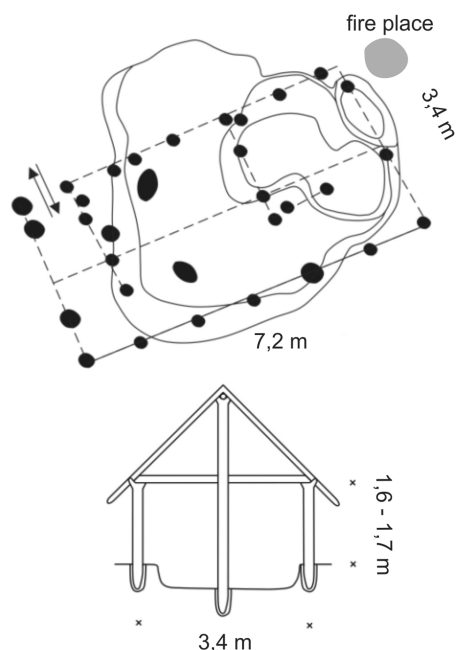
Zgornje Radvanje. Reconstruction of the building (structure 22) with trapezoidal deepening and hearth.
